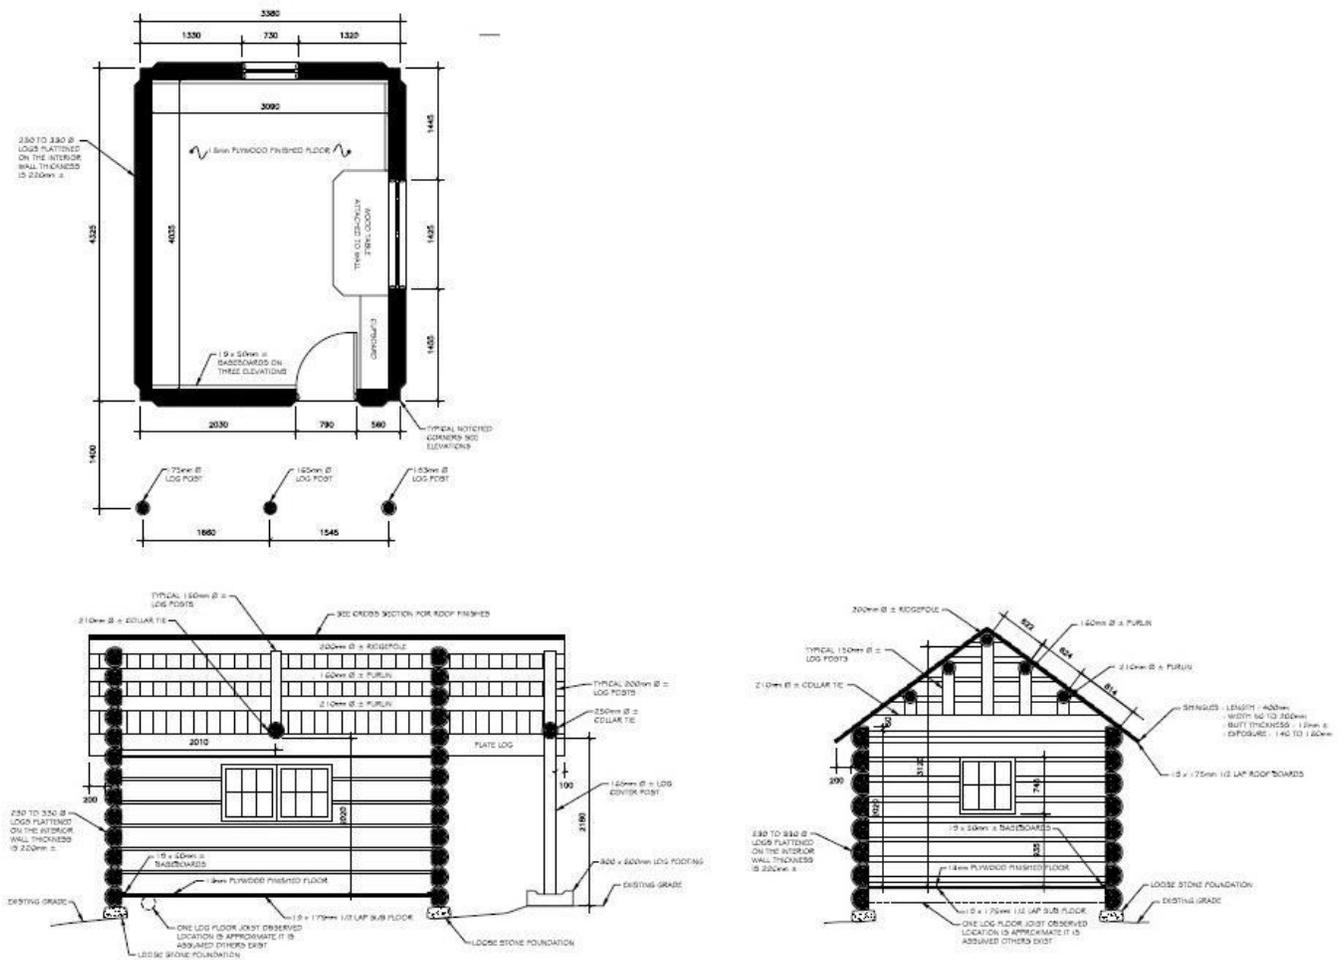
Eva Lake cabin floor plan (PWGSC, Heritage Conservation 2007).
